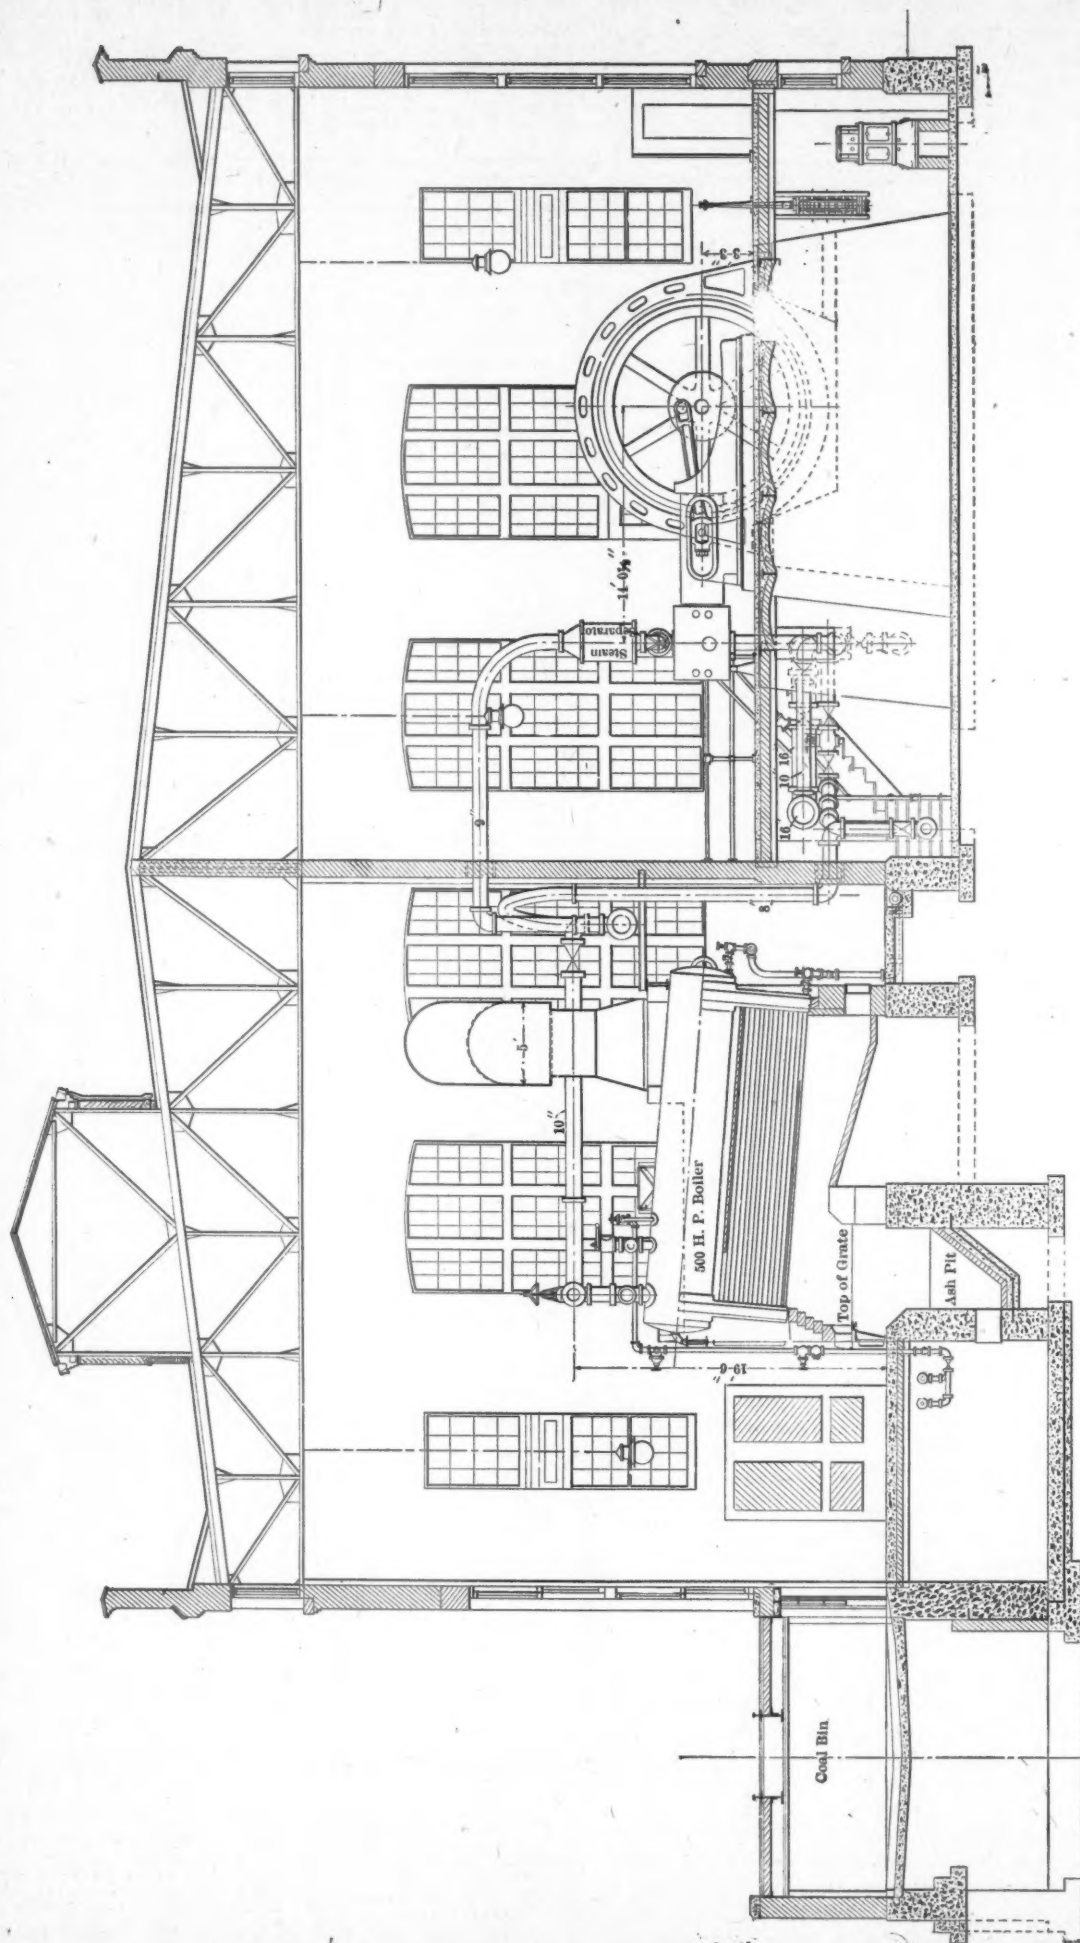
SECTION THROUGH BOILERS AND MAIN ENGINES.
